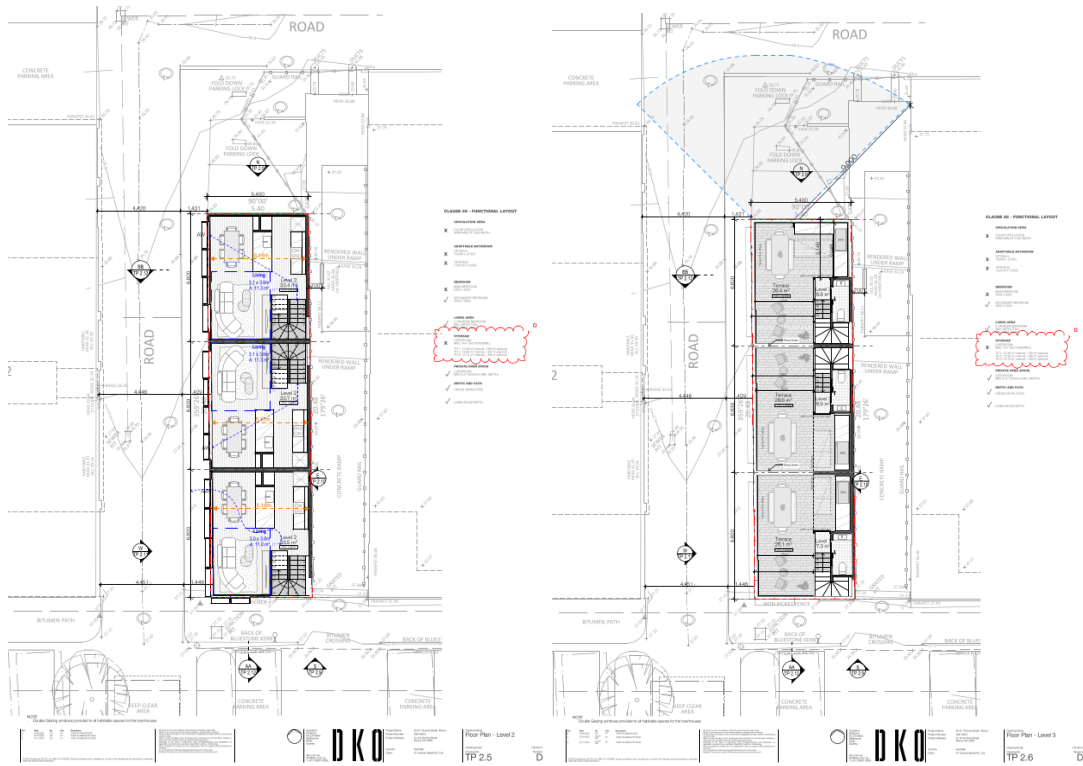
Propose 2nd floor and rooftop terrace 9 Victoria Street (Townhouses)
